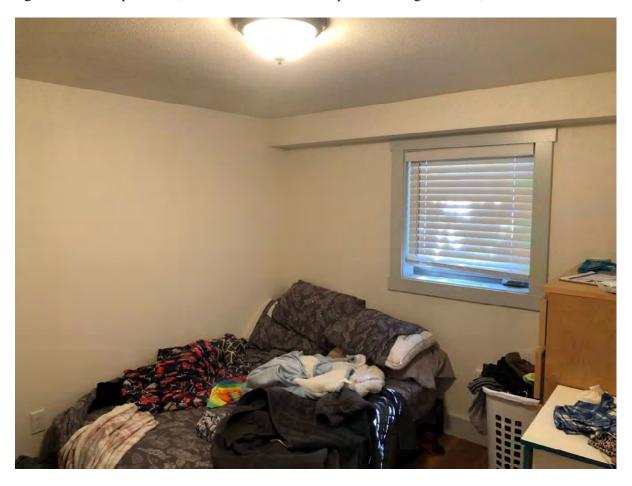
(After). Newton Apartments, Basement apartment (former boiler room and utilities area). Looking southeast. August 2020. Source: Stephen Day Architecture.
